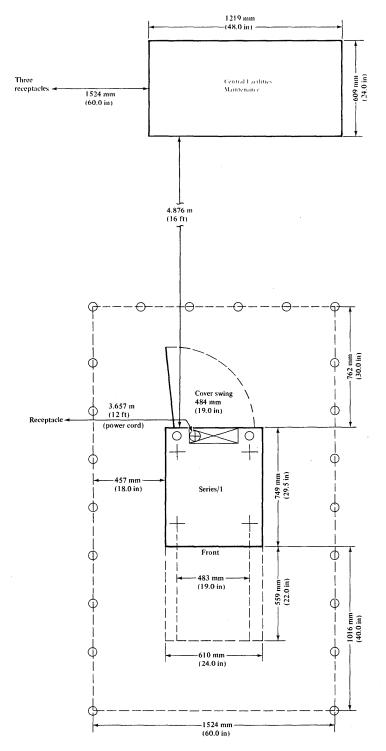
Sample floor plan for Series/1 and Central Facilities Maintenance area
